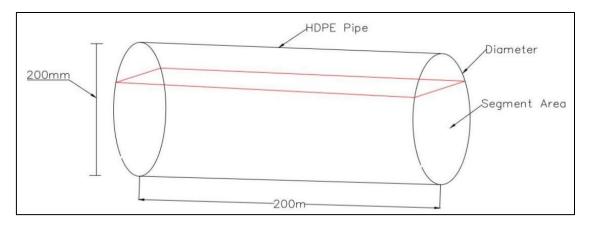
Cross-section of the HDPE collector pipe to be embedded into the ground
